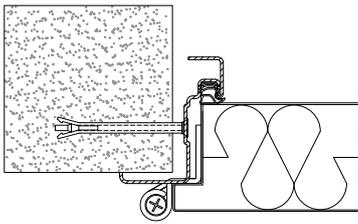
Installation with anchors directly through the opening frame - opening frame without a thermal break
